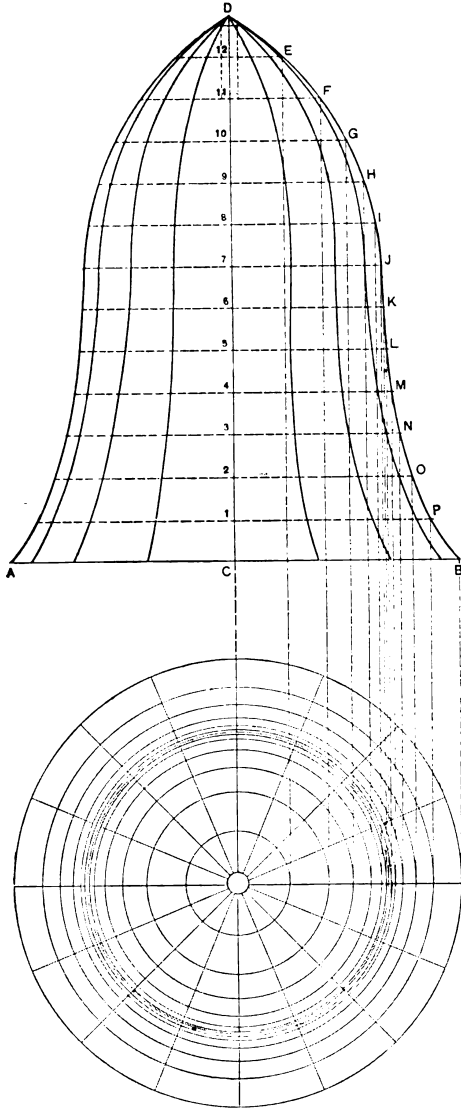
Outline Plan and Elevation of Rafters and Ribbing Sweeps.—Scale, 3/8 Inch to the Foot.
